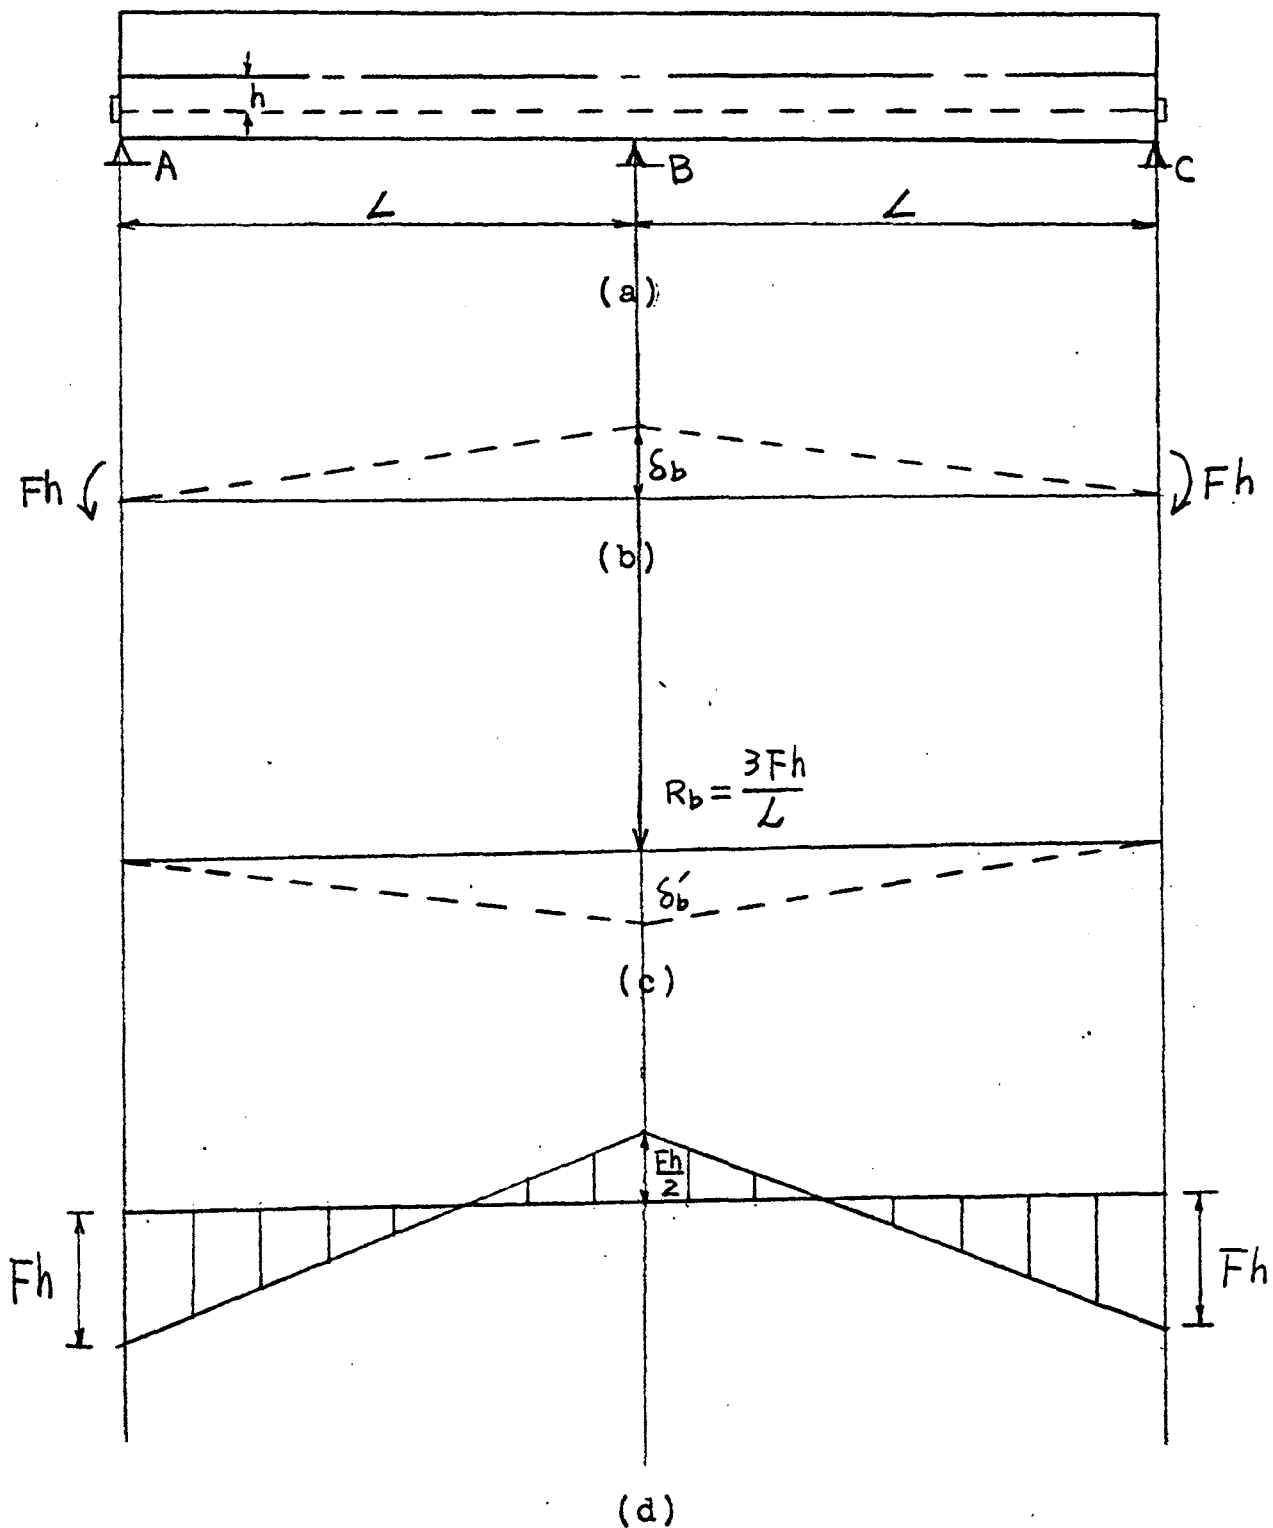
Continuous Prestressed Concrete Beam with Constant Section and Straight Tendons.
